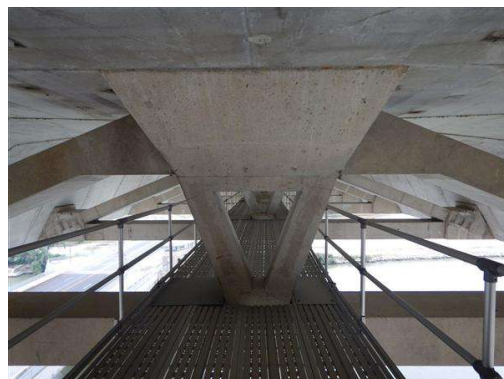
Typical map cracking on the bottom of Deck Stay Cable Anchor
